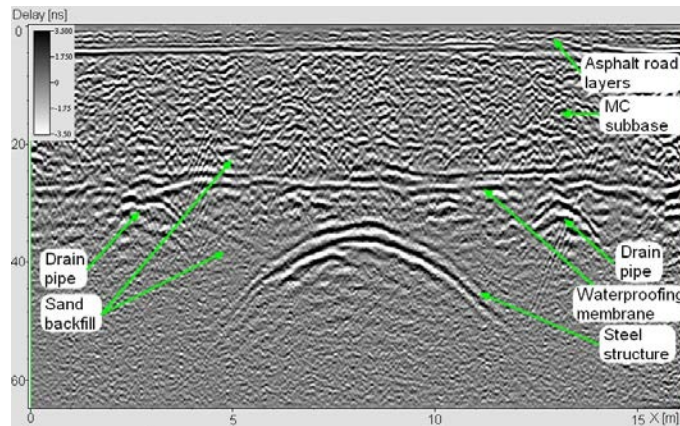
Longitudinal cross-section of the culvert (scan no. 65) with structural elements indicated.
